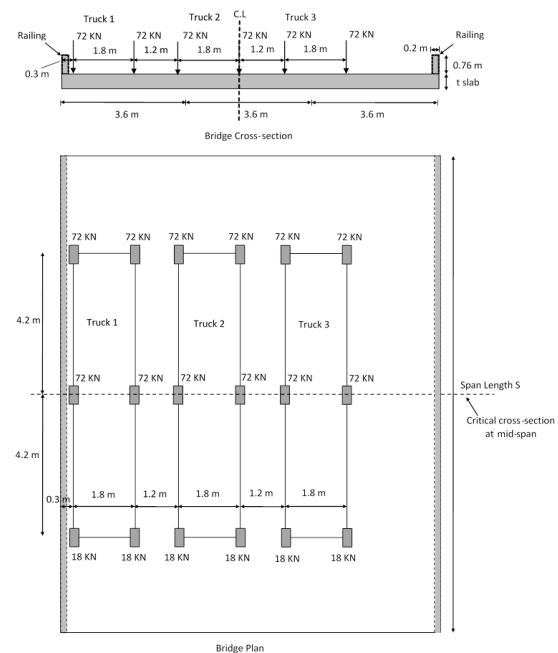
Typical cross-section and plan-view of a three-lane bridge with base case railings (X1).
